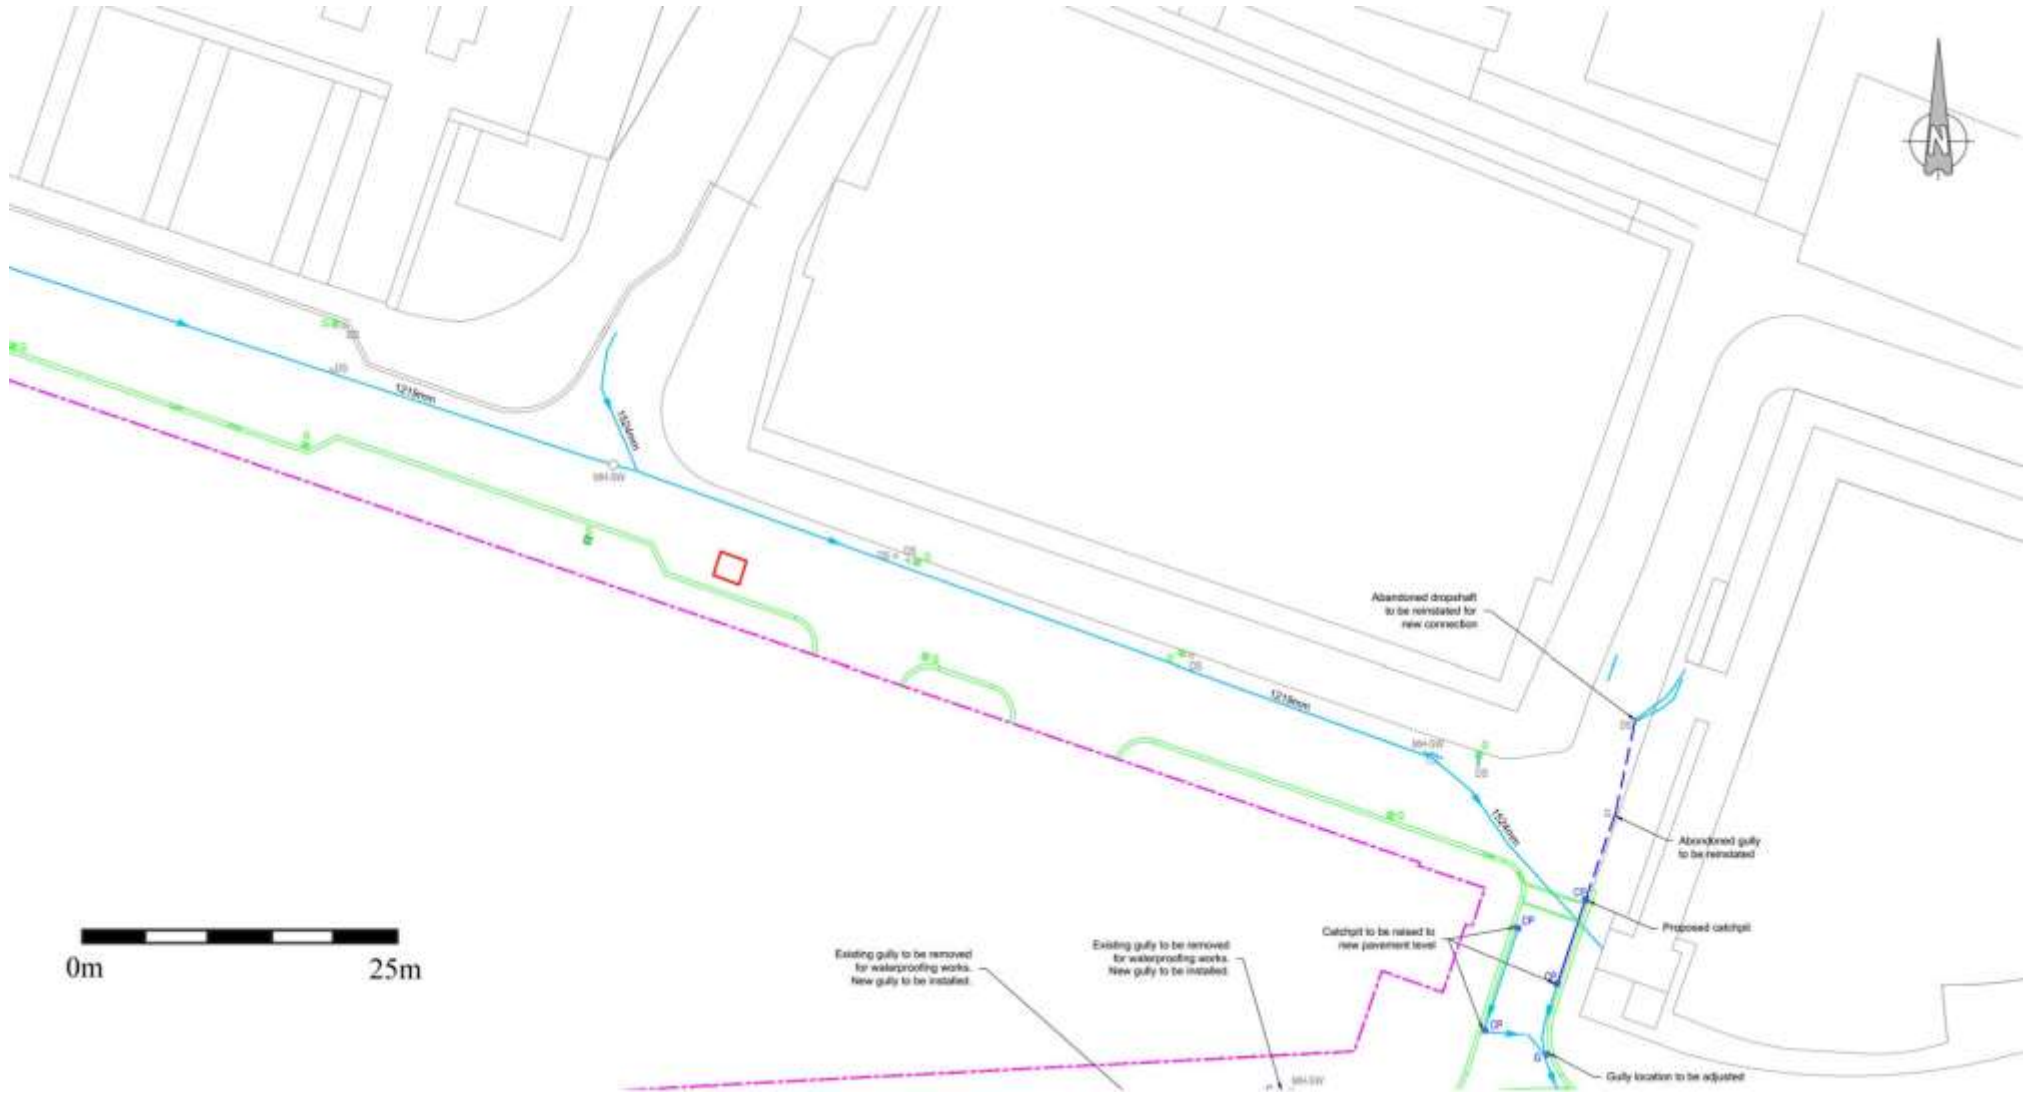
Location of drop shaft on Fore Street (marked in red), original plan provided by City of London Department of the Built Environment and amended
